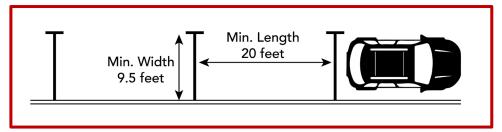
Parking Stall and Aisle Way Dimensions, Parallel
